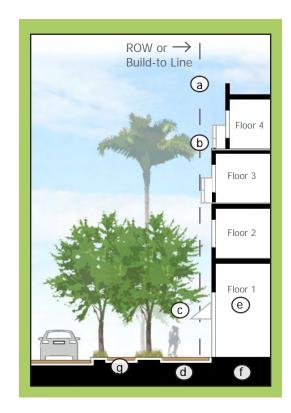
BUILDING AND STREETWALL HEIGHT STANDARDS
